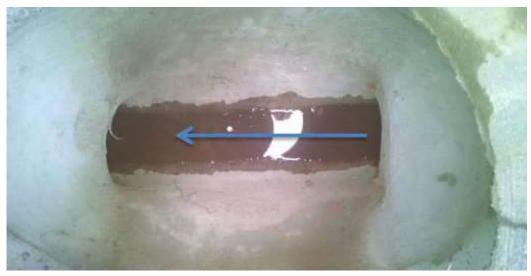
Webber Outlet 12-inch RCP pipe. Arrow shows direction of flow towards Shingle Creek.
